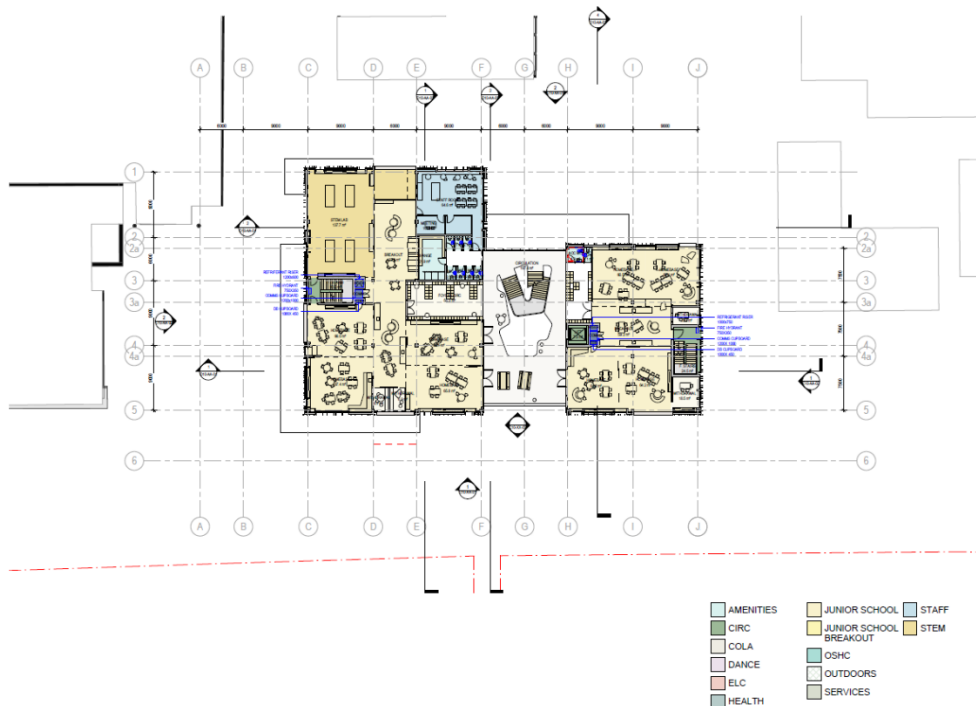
Proposed General Arrangement Plan - Level 03. (Source: BVN)
